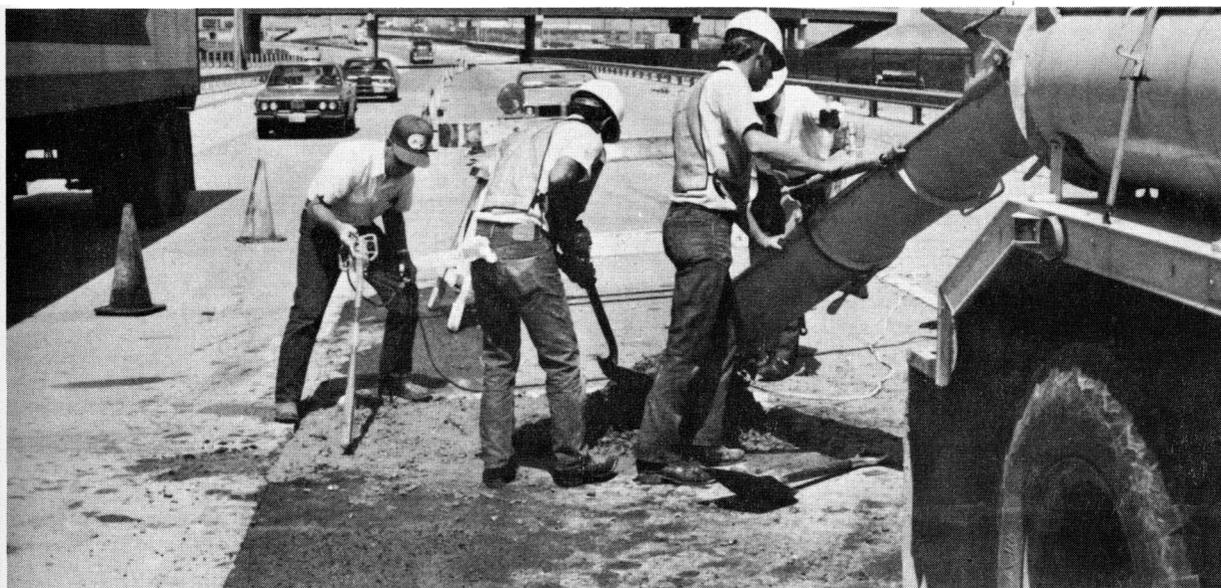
PLACING FIBER REINFORCED CONCRETE IN PATCH #1
